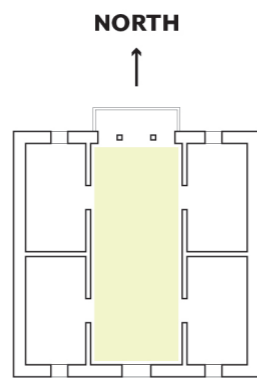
Schematic floorplan of a Lebanese Liwan house with three centered arches towards north.
